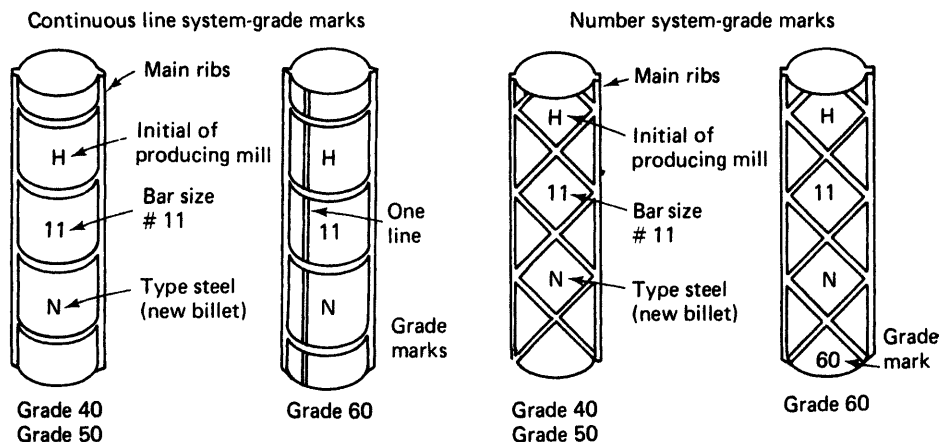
Reinforcing bar identification marks. (Courtesy of Concrete Reinforcing Steel Institute)
